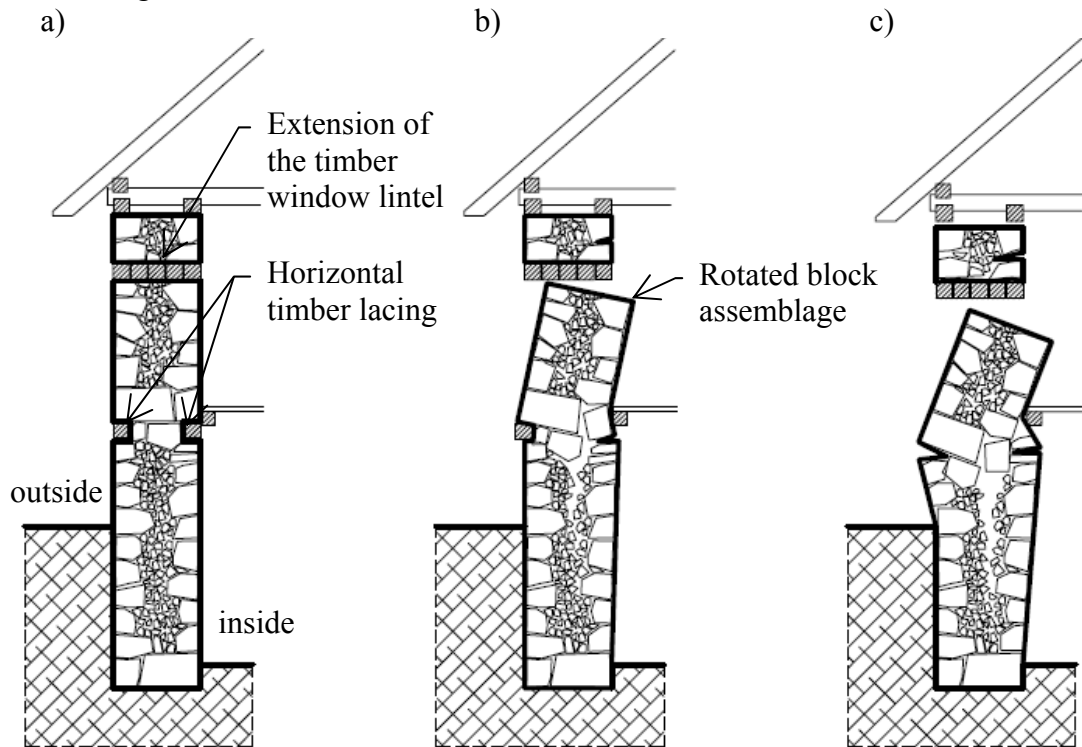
Vertical section through the northeast façade wall, next to the window jamb. Development of the collapse mechanism, a) undamaged stage, b) decay and destruction of the inner lacing caused initial overturning of the block assemblage between the lacing and the window lintel, c) local separation of masonry leaves, destruction of already decayed outer lacing, further rotation of the block assemblage and deflection of the window lintel were consequences of the new-formed loading scheme
